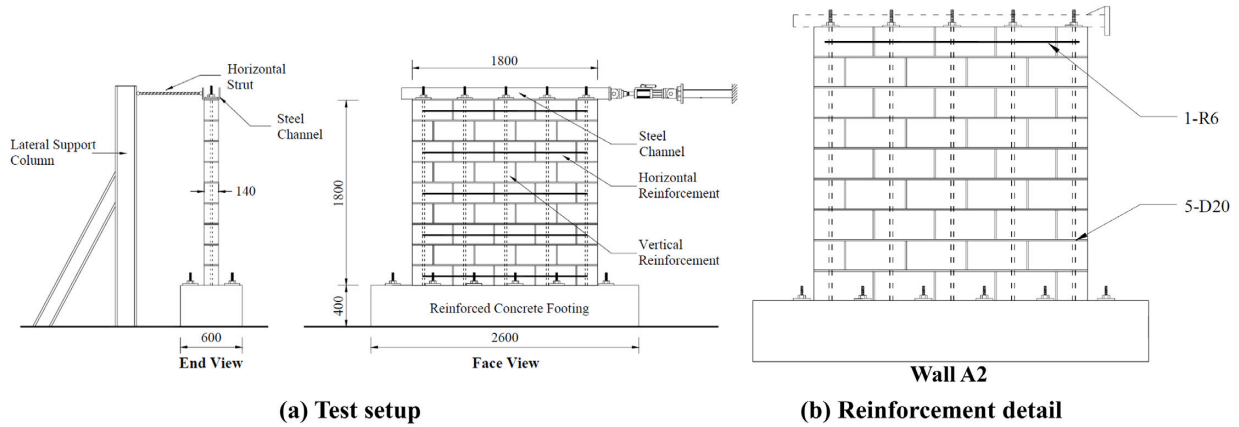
Test setup and reinforcement details of wall specimen A2 (Voon 2007).
